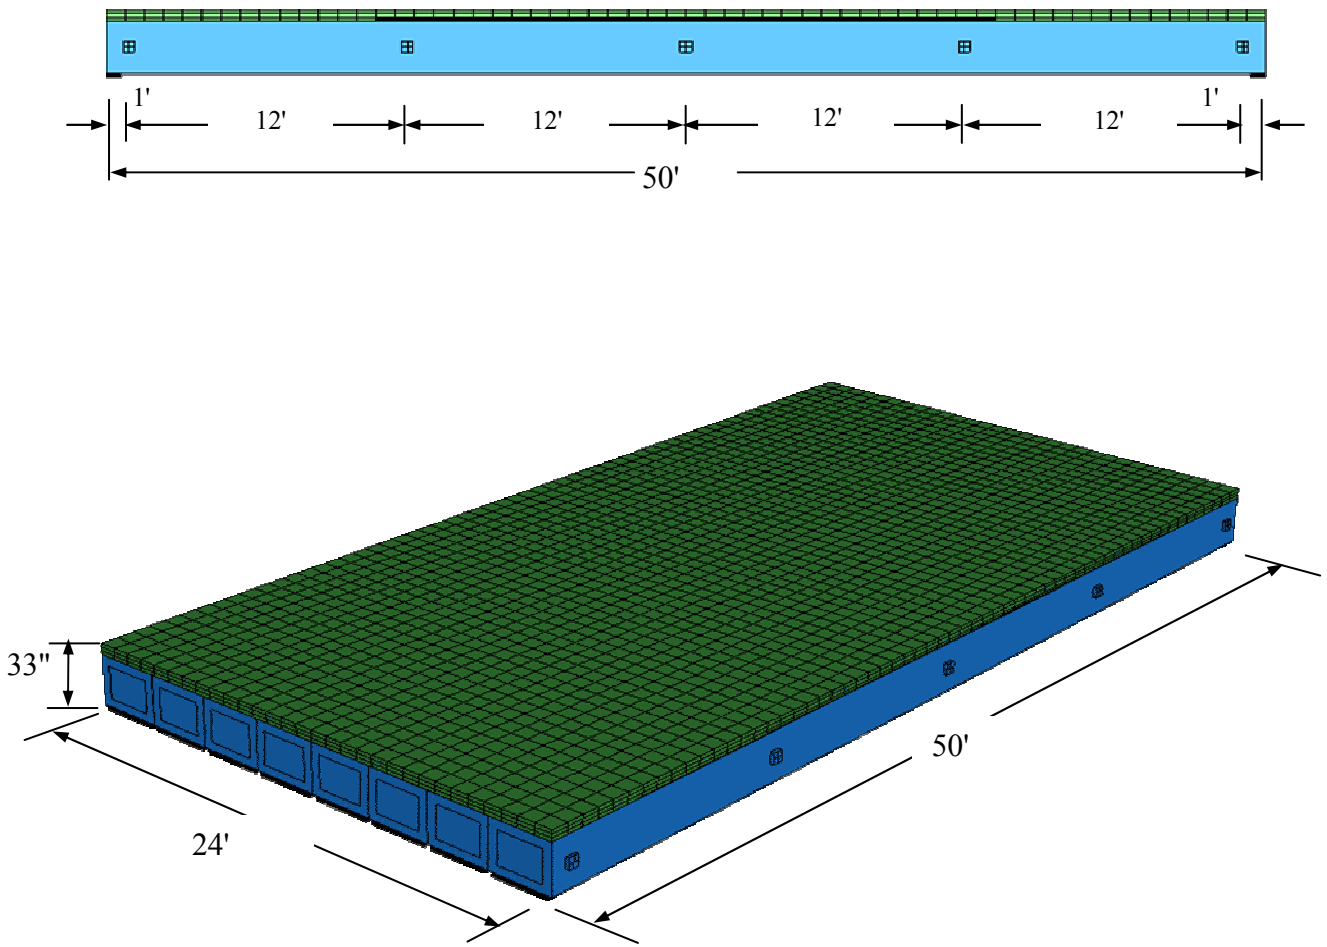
50 ft span bridge model constructed using 36 in. wide box-beams.
